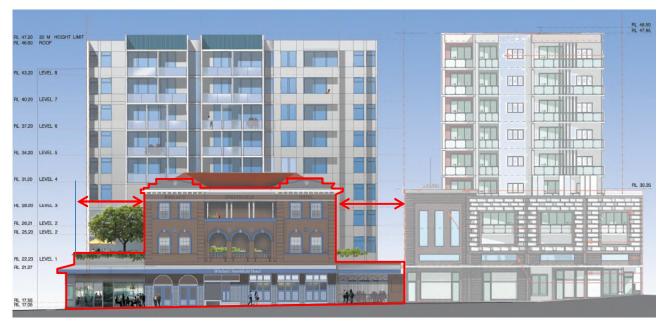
INITIAL DA PROPOSAL Streetscape view from southern side of Everton Road showing façade of The Hotel Core's façade and parapet. The design provides for generous side setbacks to retain the prominence of The Hotel within the Everton Road Streetscape as indicated by the red outline and setback arrows. Building indicated to the right represents approved DA for Nos 19-21 Everton Road.
